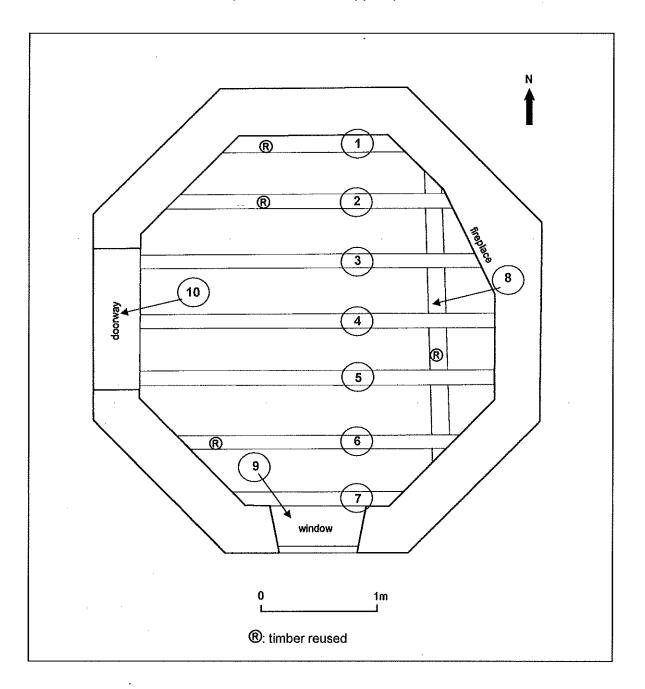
Plan of the first-floor frame of Shifnal Manor Gazebo to show sample locations (after Richard Sheppard)
